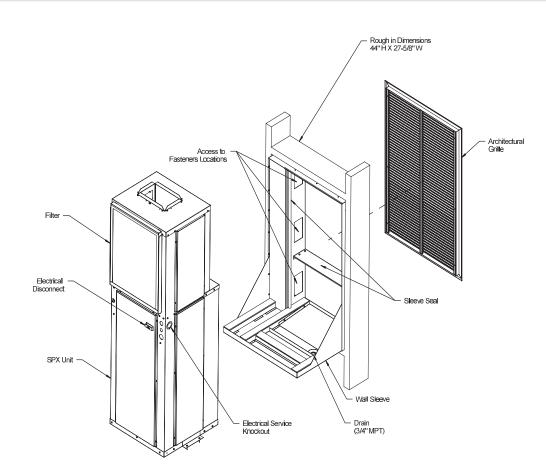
B - General Assembly for Large sleeve and Grill for 09-18 sizes with block off
